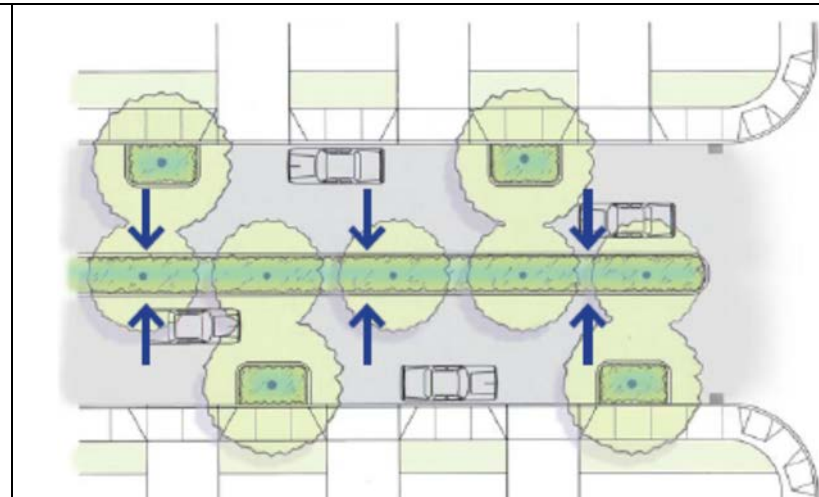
Reverse Crowned Street Profile. A reversed crowned street is the opposite of a crowned street and directs runoff to the center line of the street. GI facilities may be considered in the median.
